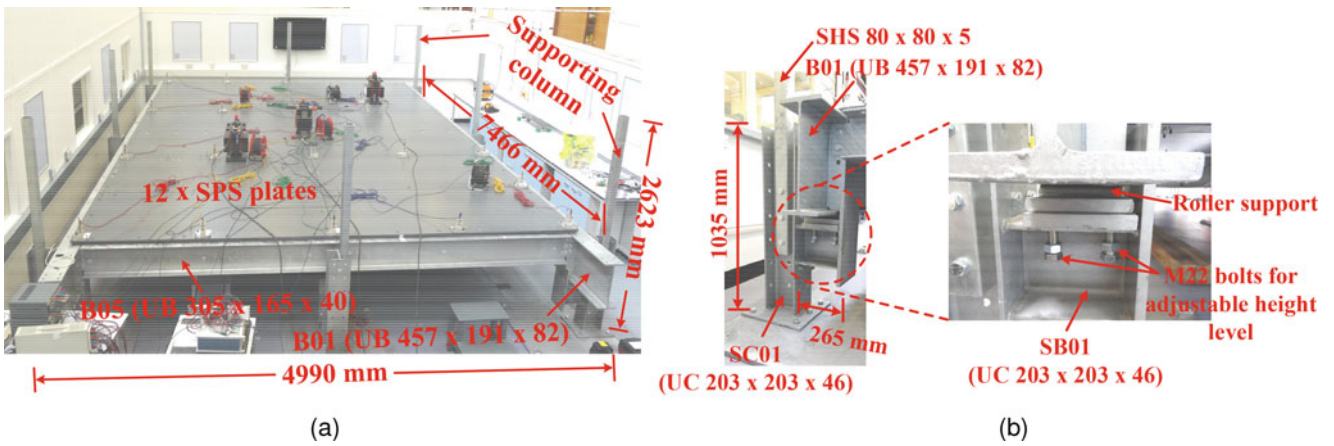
Reconfigurable test-bed floor panel structure. (a) Test floor panel. (b) Zoom in view of the support boundary condition
